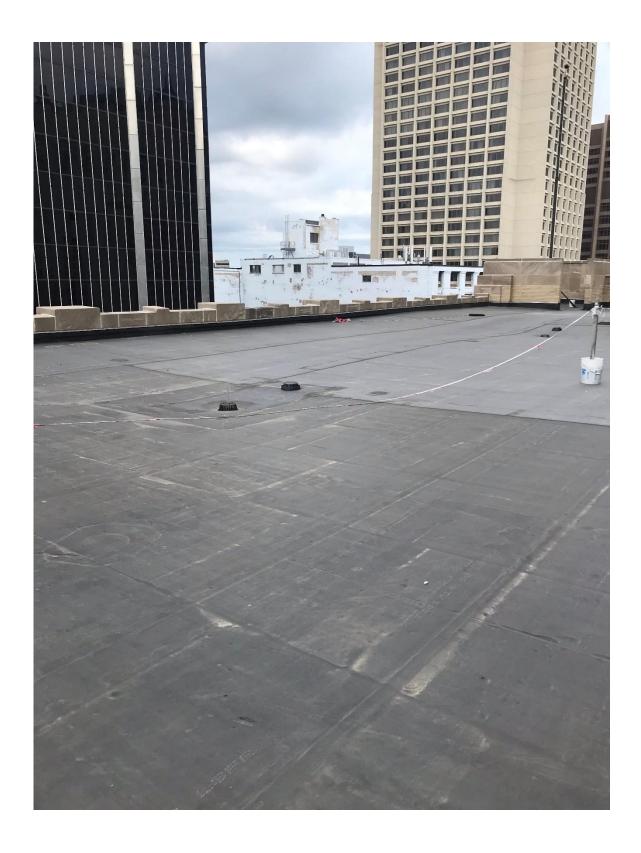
Exterior, West Roof, Looking Northwest. 7/31/19
